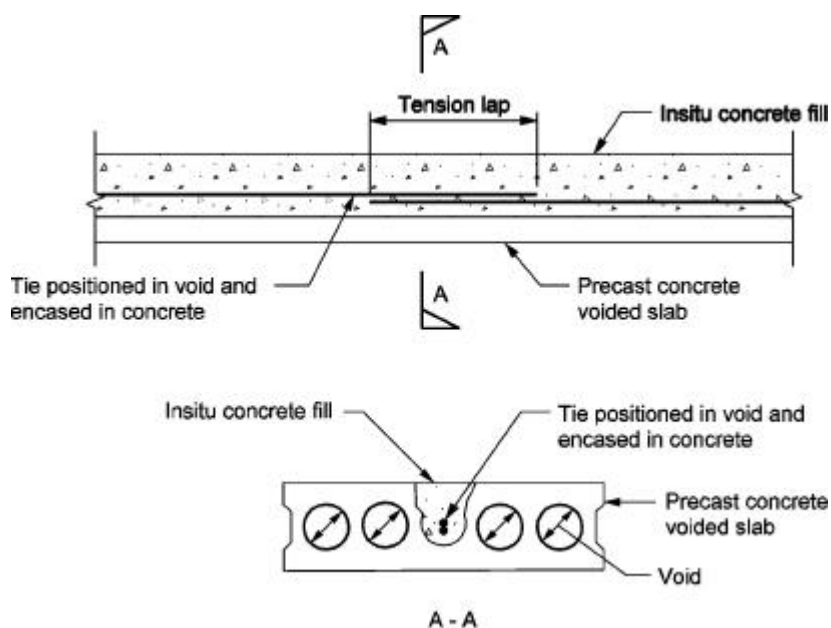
Continuity of ties: bars in precast member lapped with bar in insitu concrete
